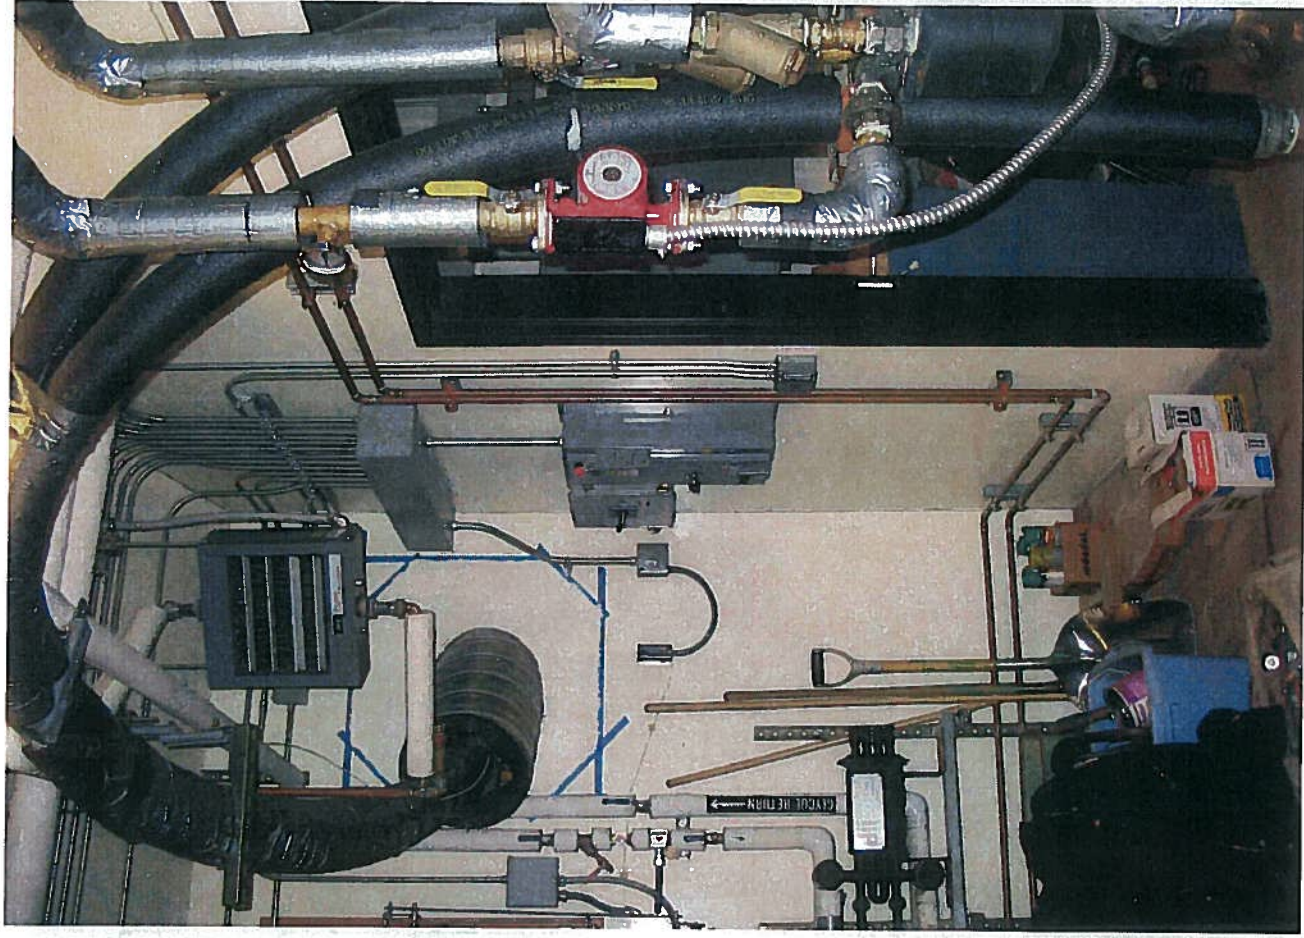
Pex Pipe from Wood Heat System Entering Boiler Room in WTP
